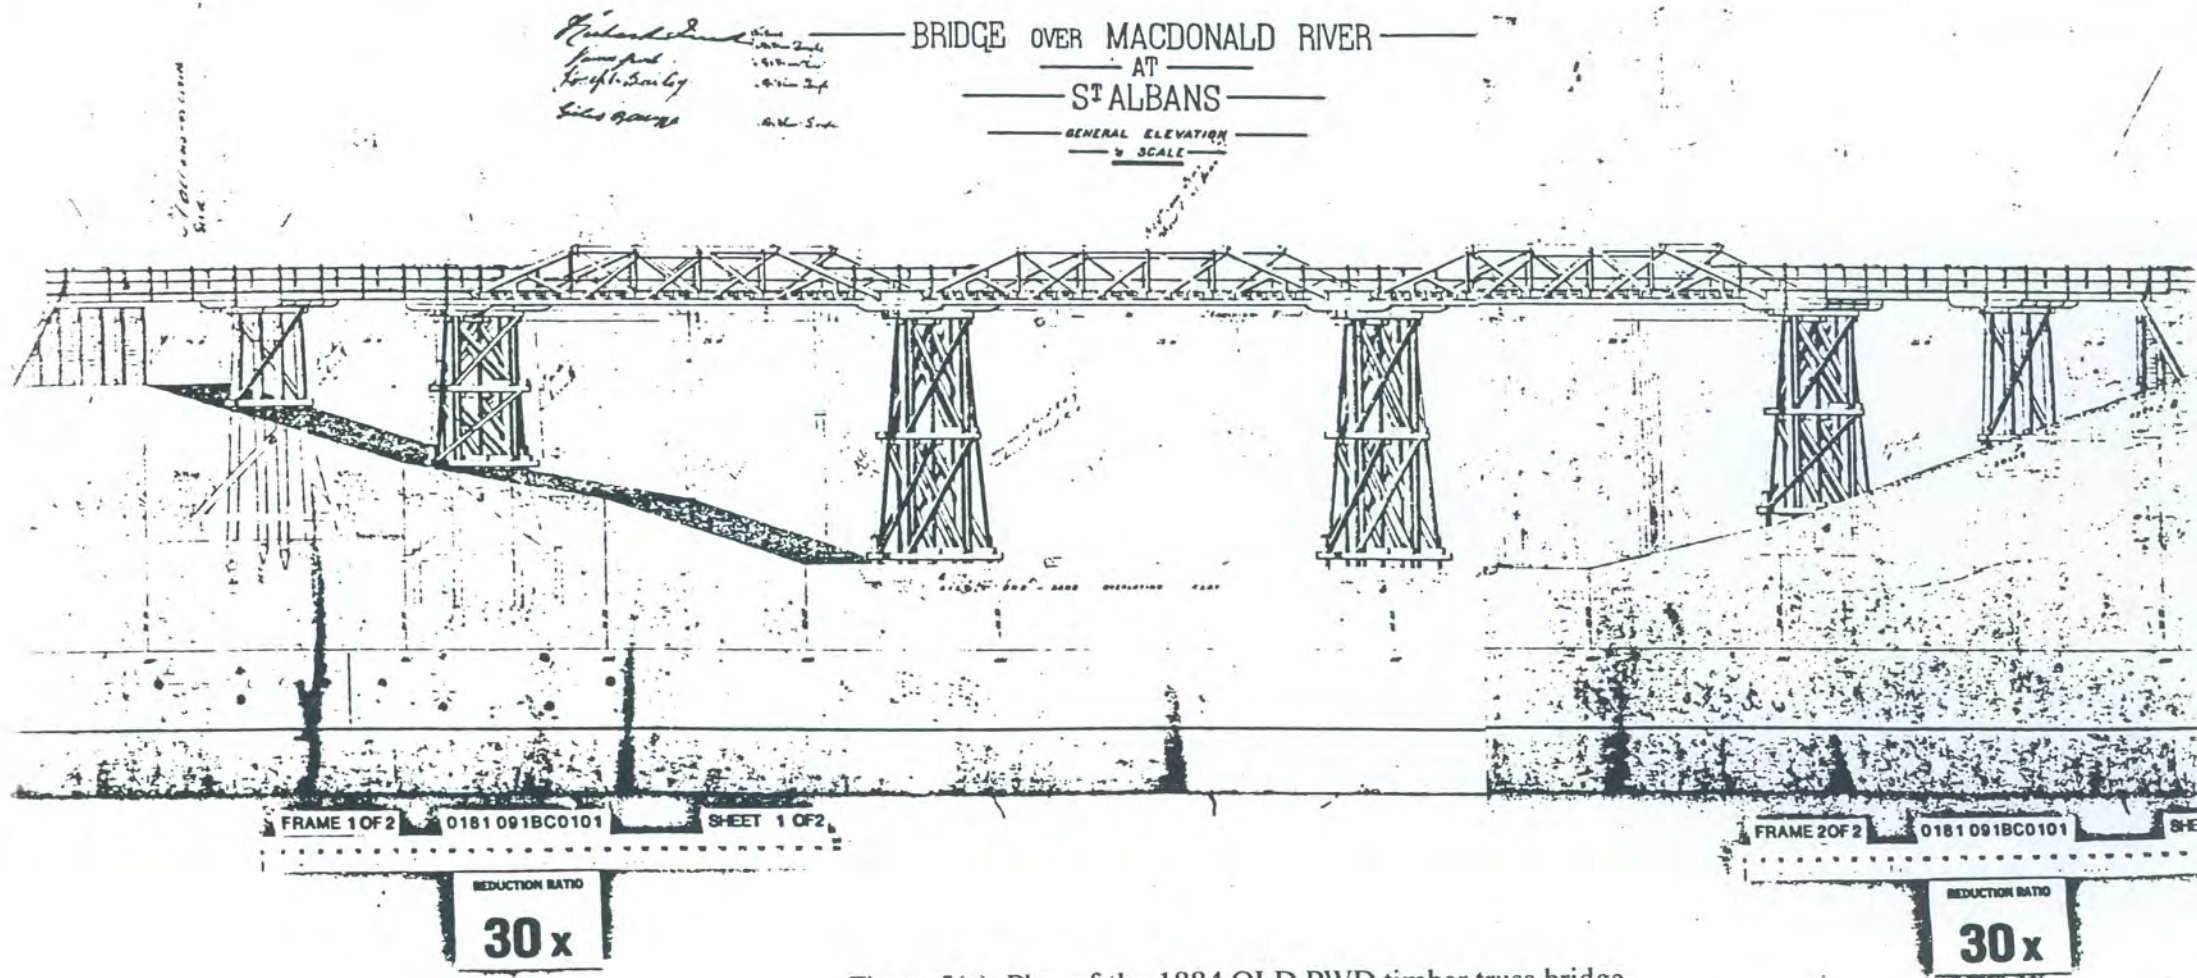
(a) Plan of the 1884 OLD PWD timber truss bridge.
